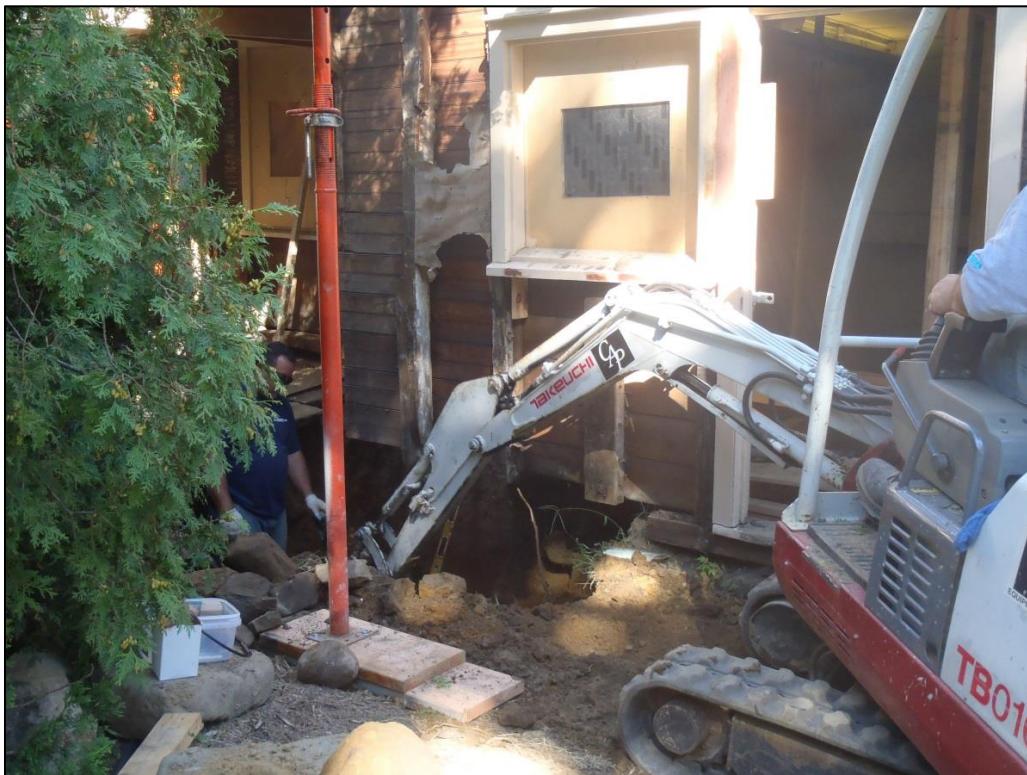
Trench 3 – Excavation in progress; southern house exterior, adjacent to south wall of Room 115.
